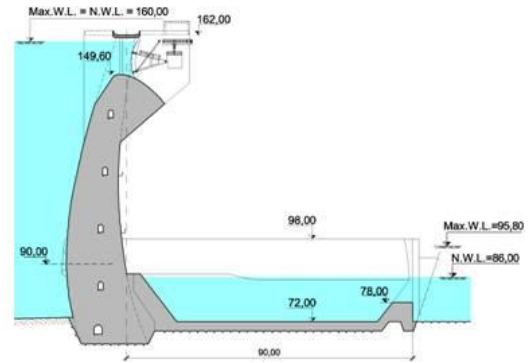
Foz Tua Hydroelectric Project. Preview and cross section of the dam.
